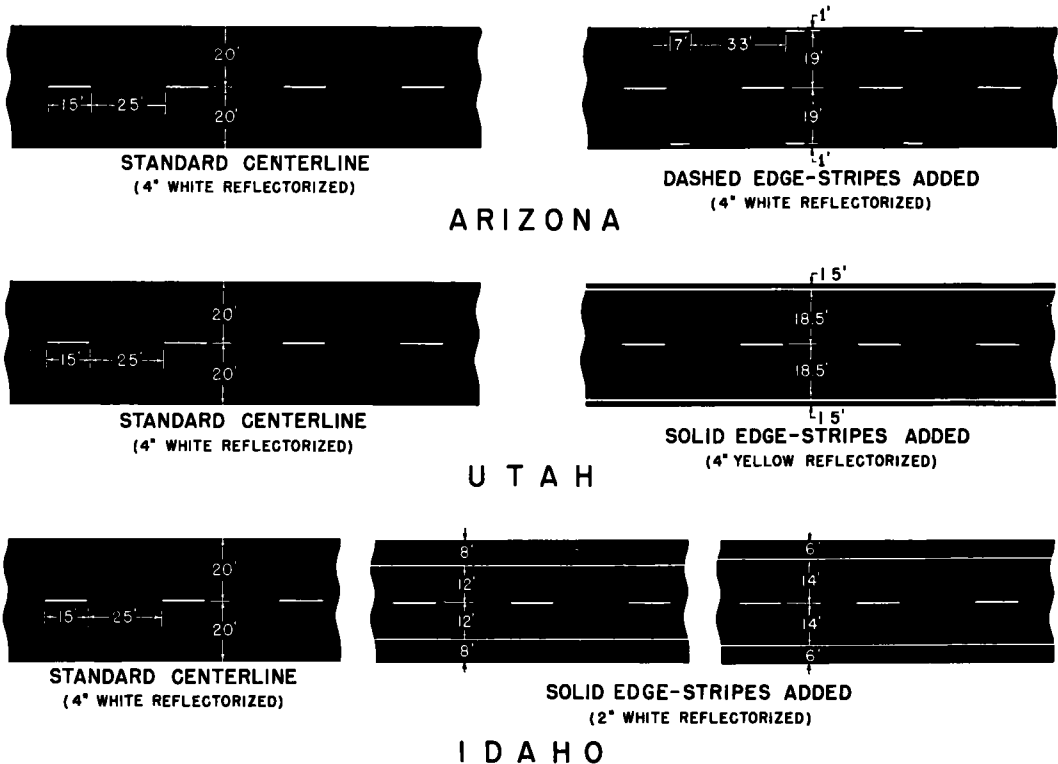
Edge striping on sections paved to their full shoulder width on rural 2-lane bituminous pavements.
